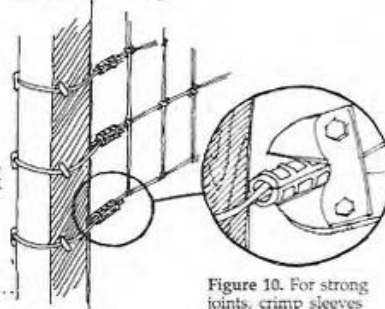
For strong joints, crimp sleeves with large pliers or a crimping tool. Cut off protruding wires. Be sure to pick up scraps.
